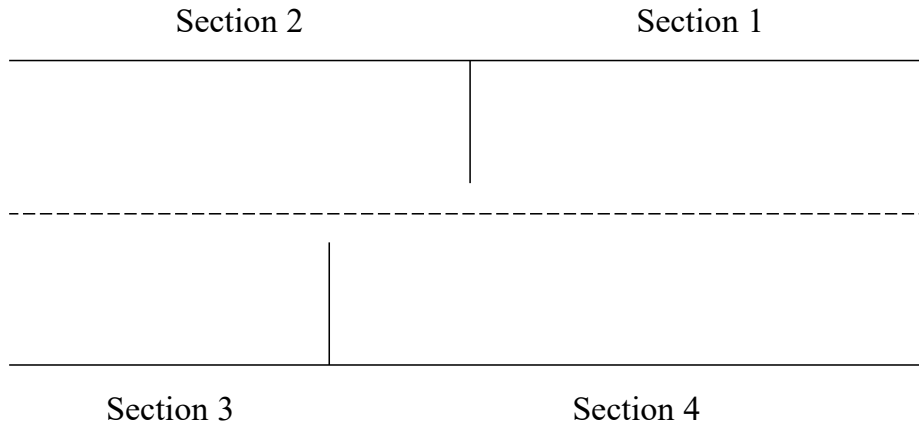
Layout of Pavement Sections at the Medina County Test Site.
